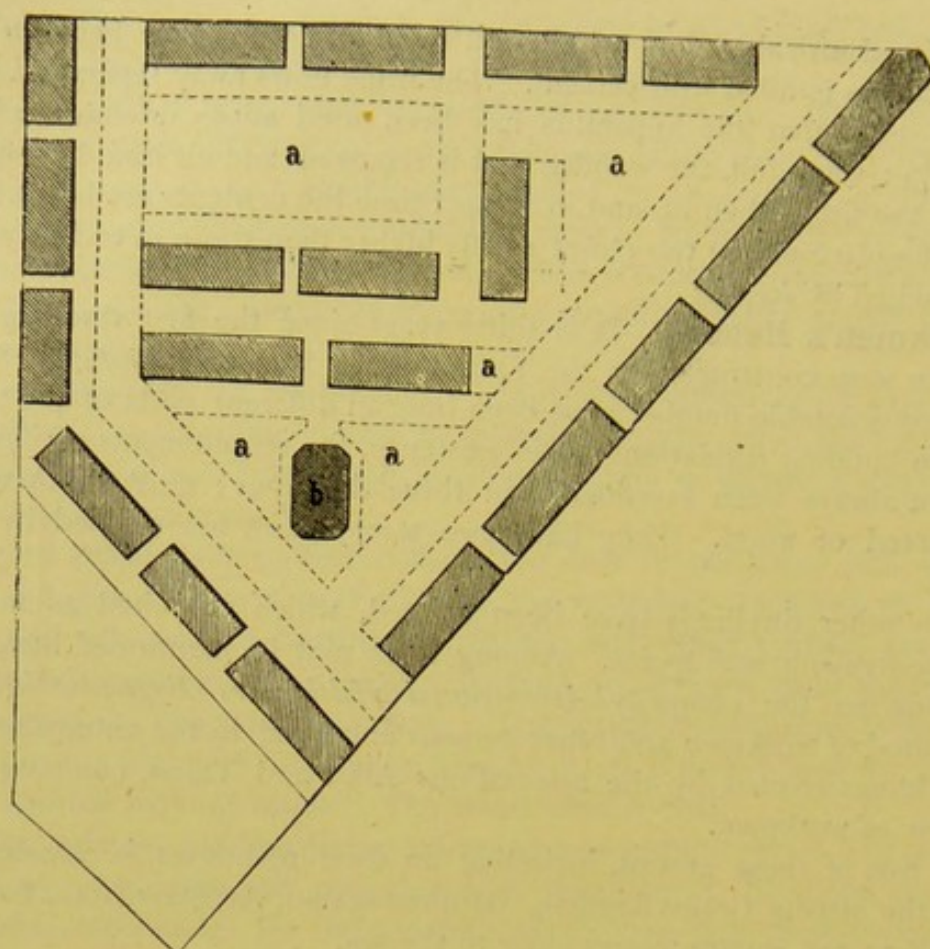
PLAN OF A GROUP OF WORKMEN'S DWELLINGS.
